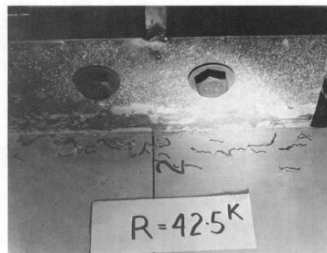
B-44: SPALLING AT END PLATE
